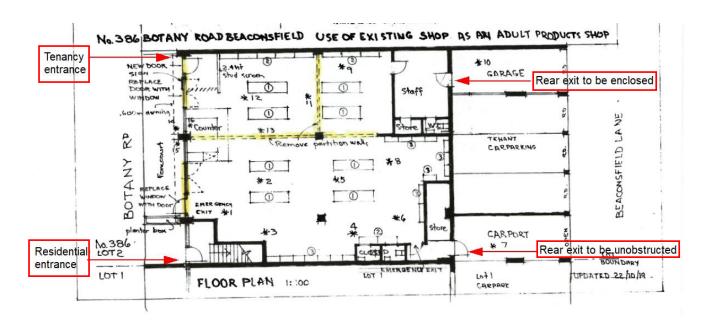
Proposed floor plan, showing the joining of existing two tenancies into one shop and proposed access points.
